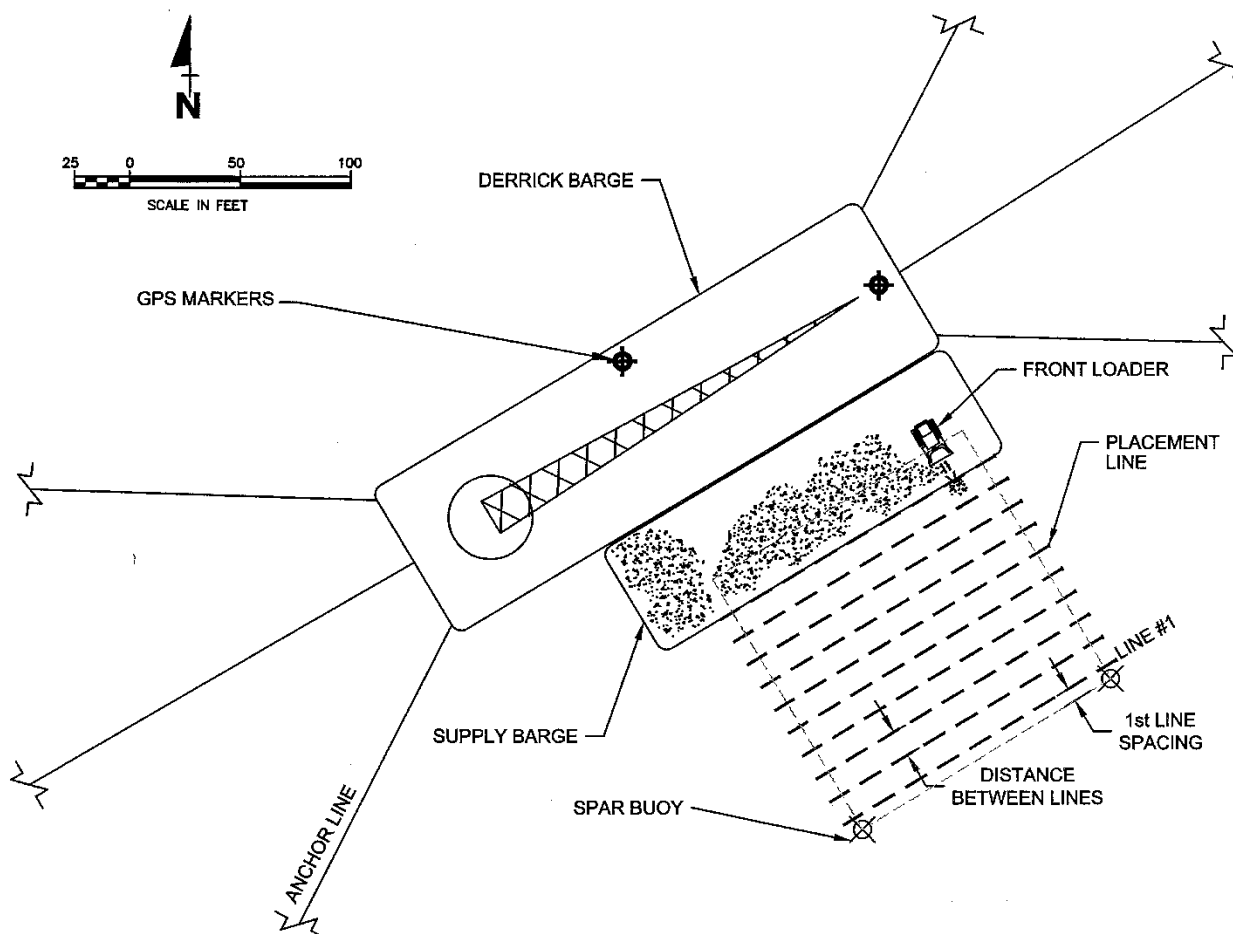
Photos and Figure of Proposed Installation Method (page 2 of 2)
